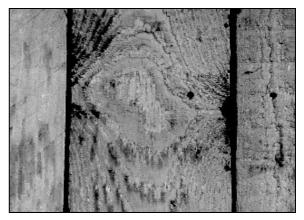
Area of the zinc sheeting contacting a wood scar (left) and the corresponding wood scar in the wood deck (light)
